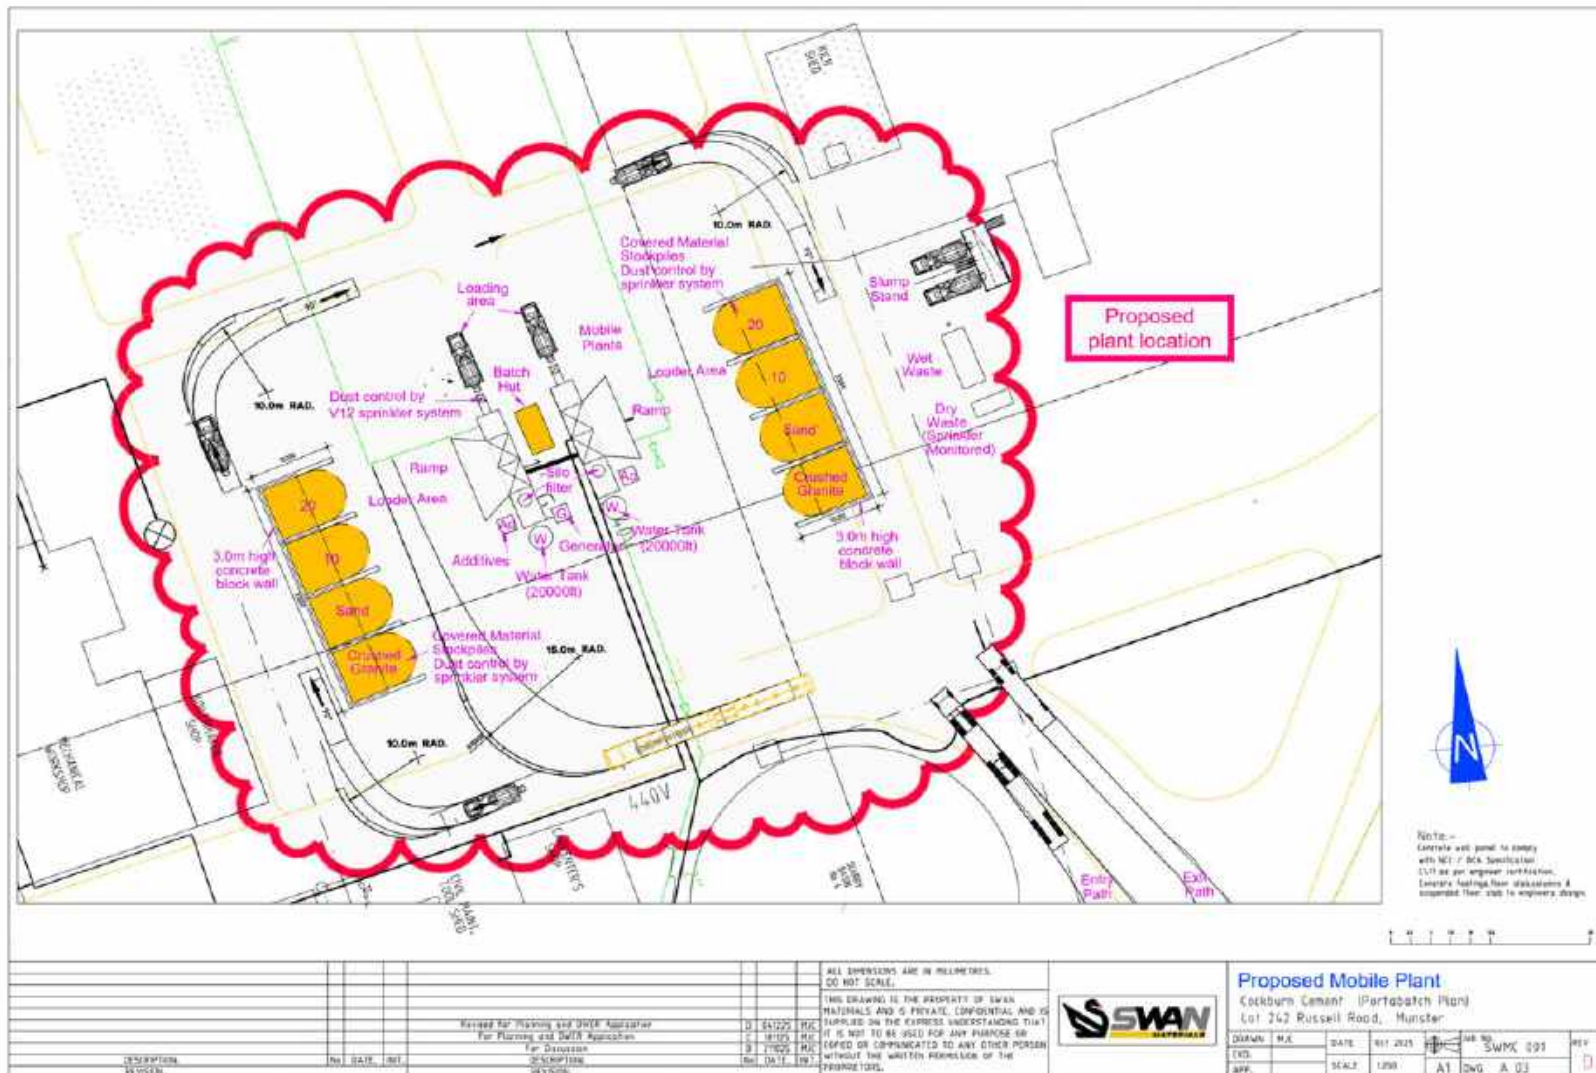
Conceptual Plant Layout Diagram Swan Concrete Munster
